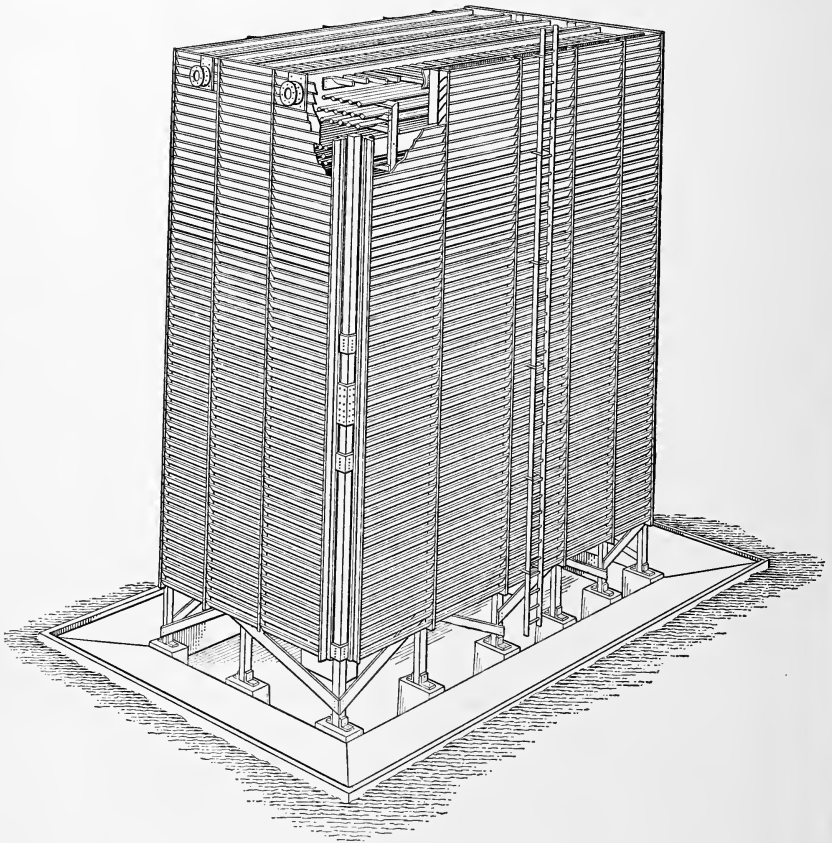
C. H. Wheeler Atmospheric Cooling Tower.
